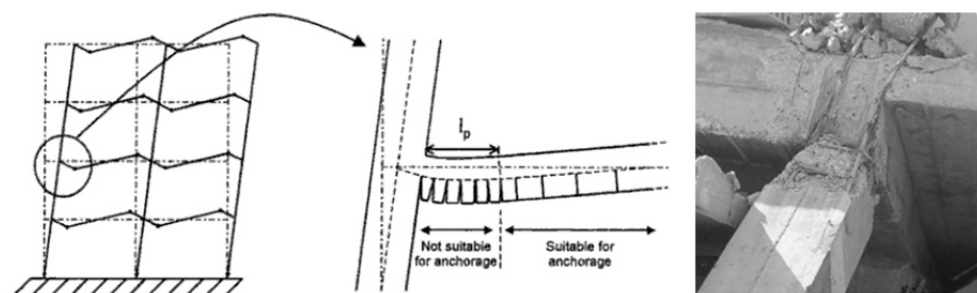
Member cracking assuming a strong-column, weak girder design
